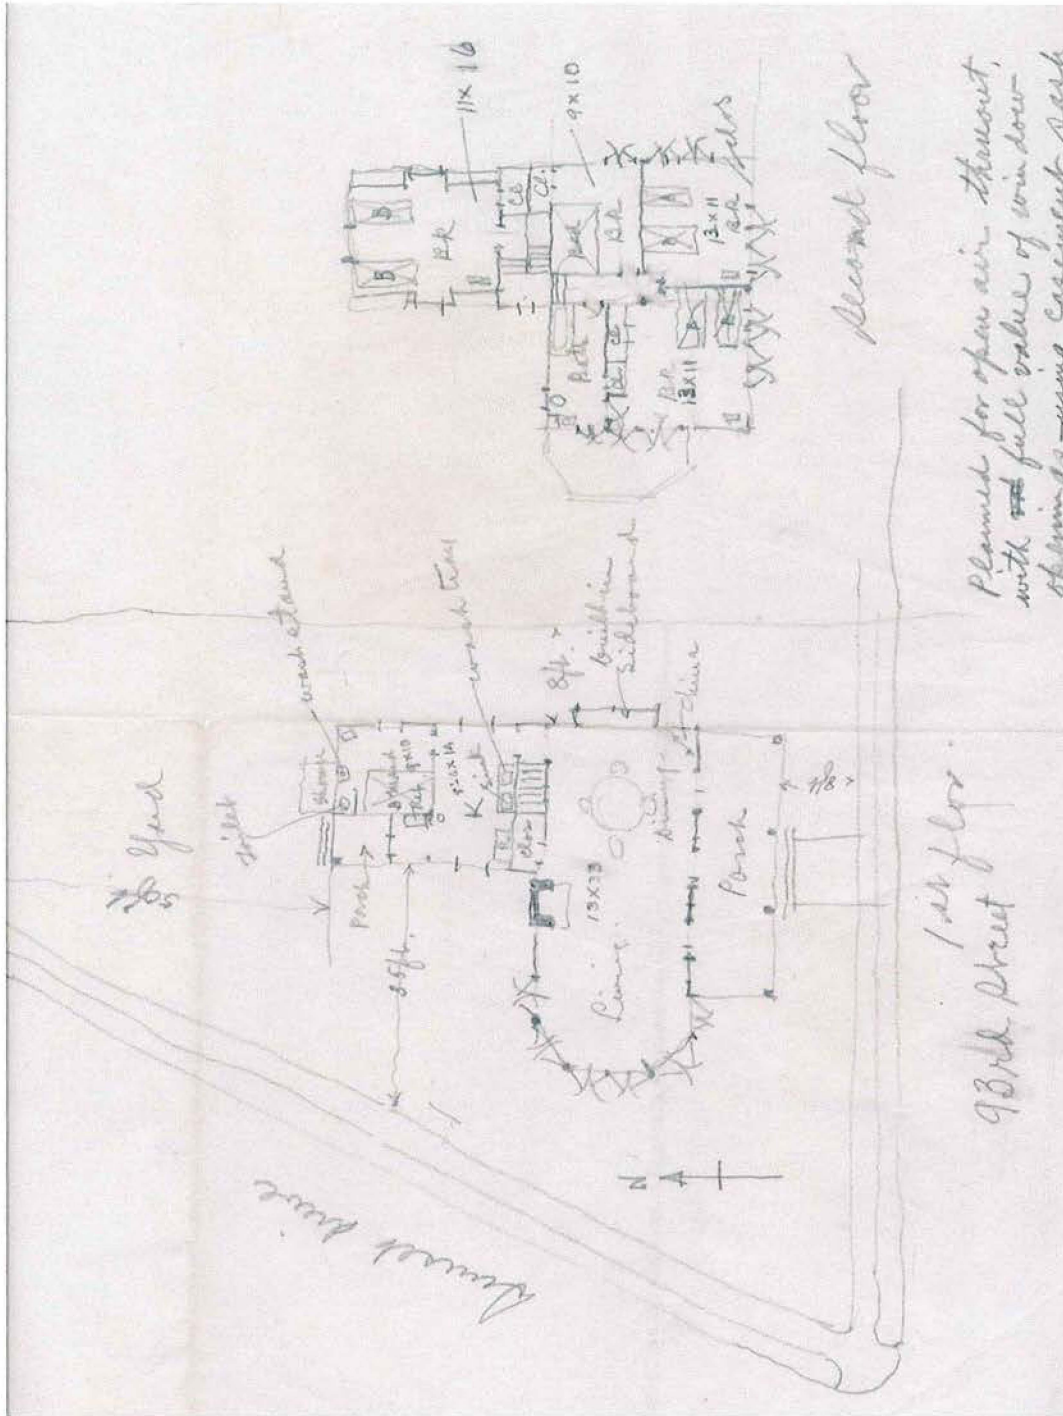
hand-drawn sketch of Rufwud's floor plans by Oscar M. Hokanson, ca. 1915.
